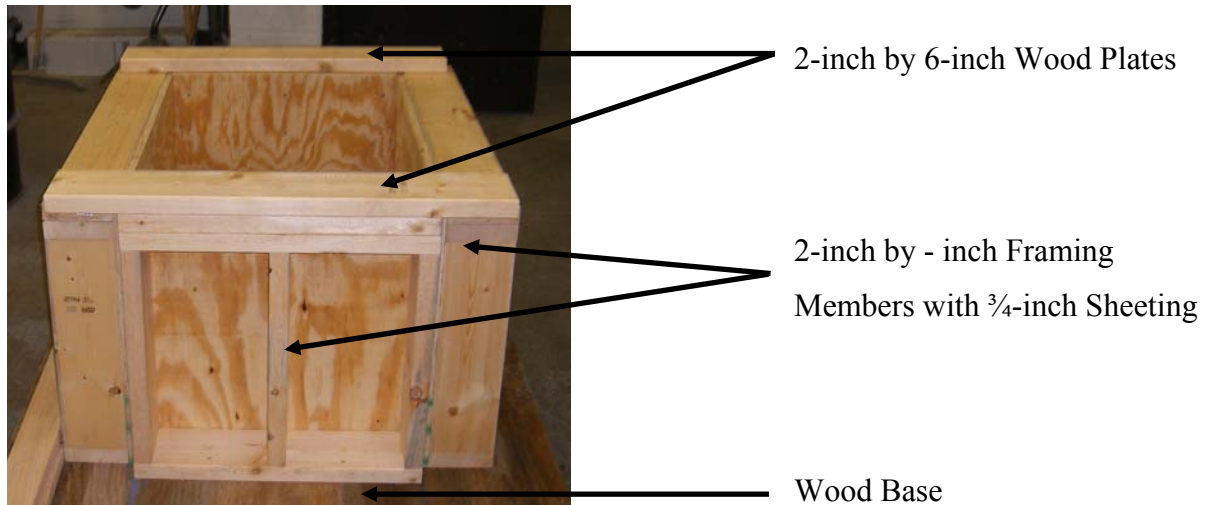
Wood Jig Used to Construct Cage for LBPT
